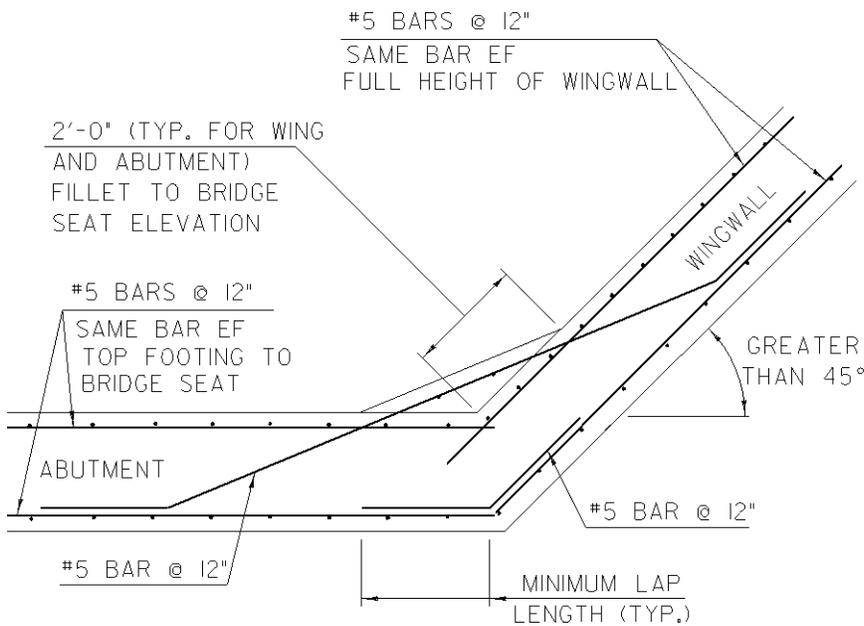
2 Wing wall corner detail for more than 45° angle
